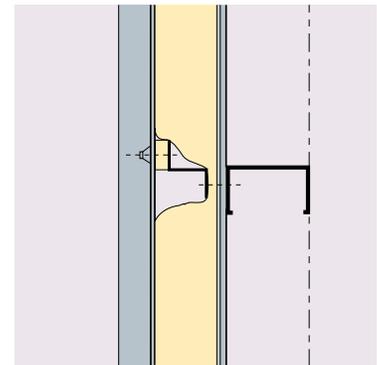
Sidewall cladding with Rockwool Cladding Roll and Rock-Lam Thermal Break strips - Weighted sound reduction index = Rw37 dB
